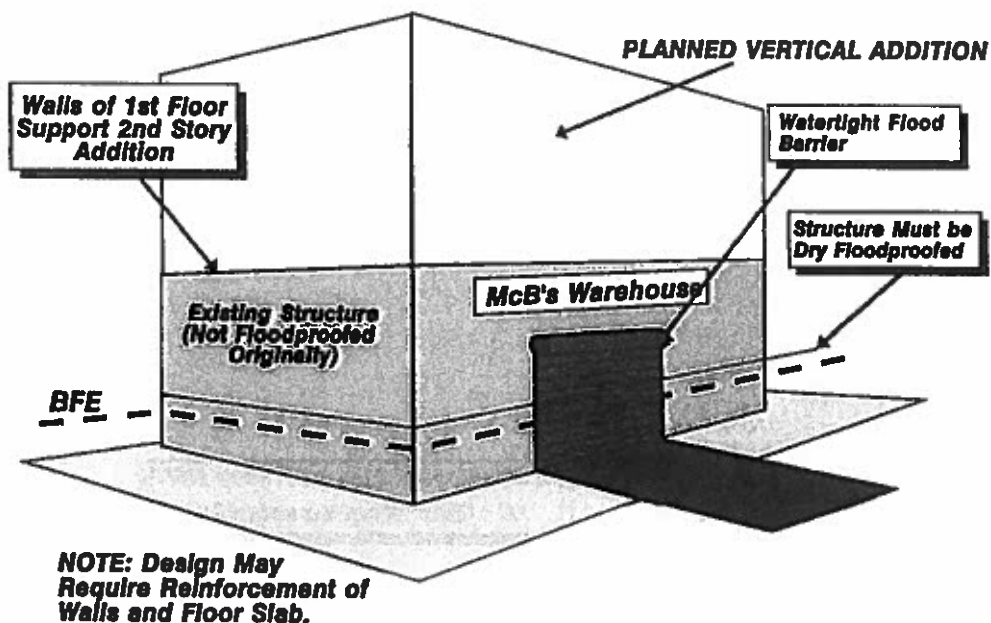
Vertical addition to a nonresidential building in an A Zone.
